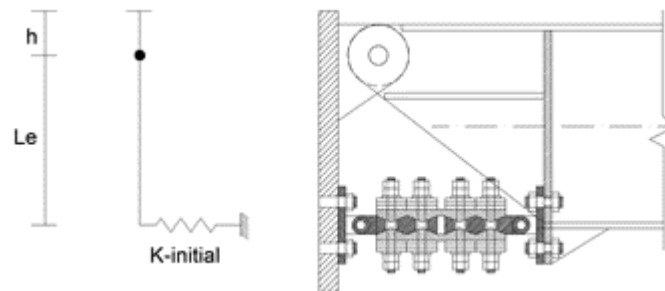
Damage avoidance steel beam moment connection with RSFJs
